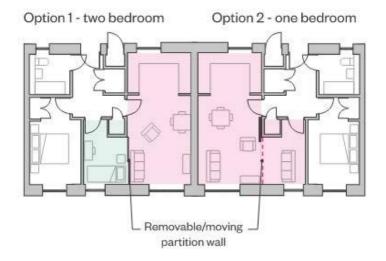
Design for adaptation using a flexible floor plan e.g., one bed flat can be converted to a two bed fat or a one bed fat with space for home working.
